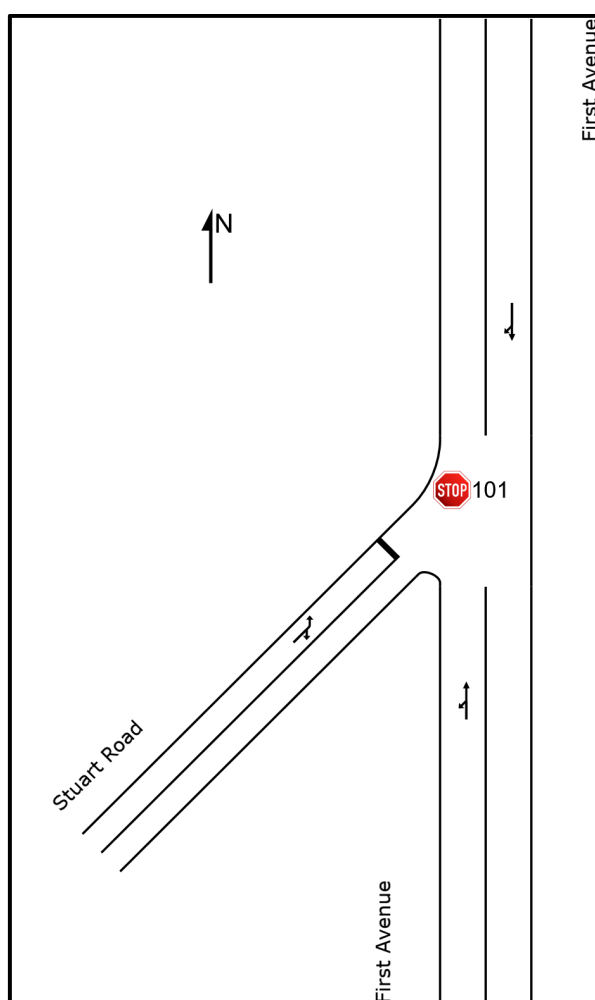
Stop Intersection of First Avenue South with Stuart Road (SIDRA)
